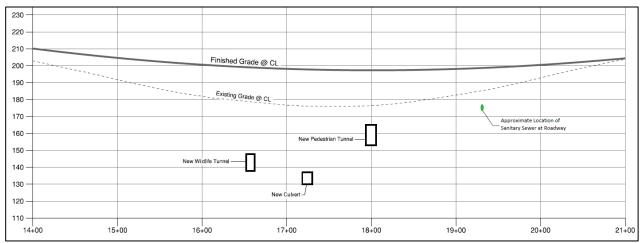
profile of the road and approximate locations of the culvert and tunnels
